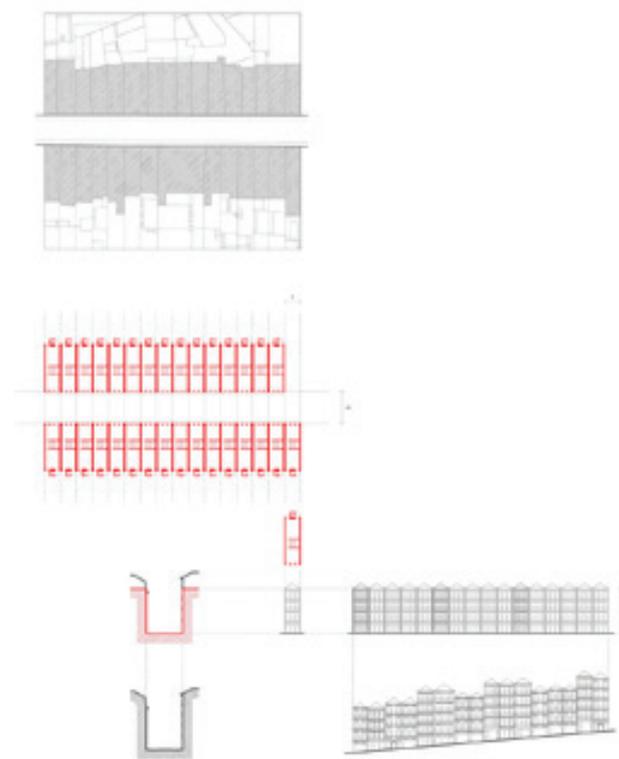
The building-type designs the street. Almada Street, Oporto: 1. Street plans. 2. Conjectural plan-type based in building-type serial repetition. 3. Comparison between Section-type and Built section. 4. Comparison between Façade-type and Built façade
